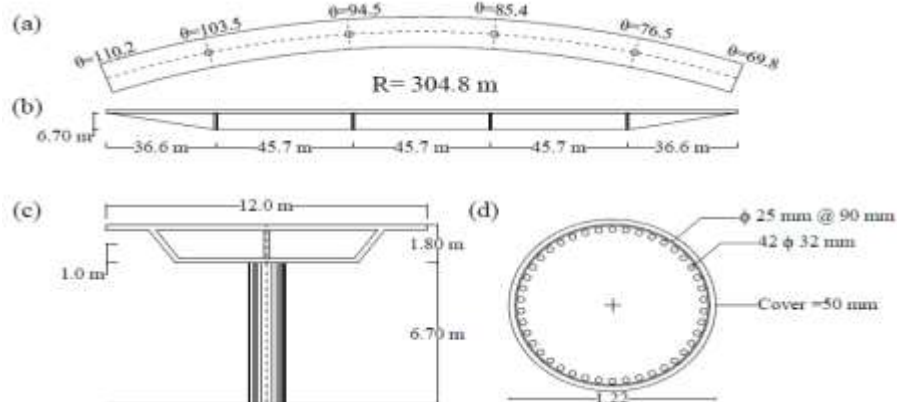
(a) Plan, (b) View and (c) Section of the deck and columns.
